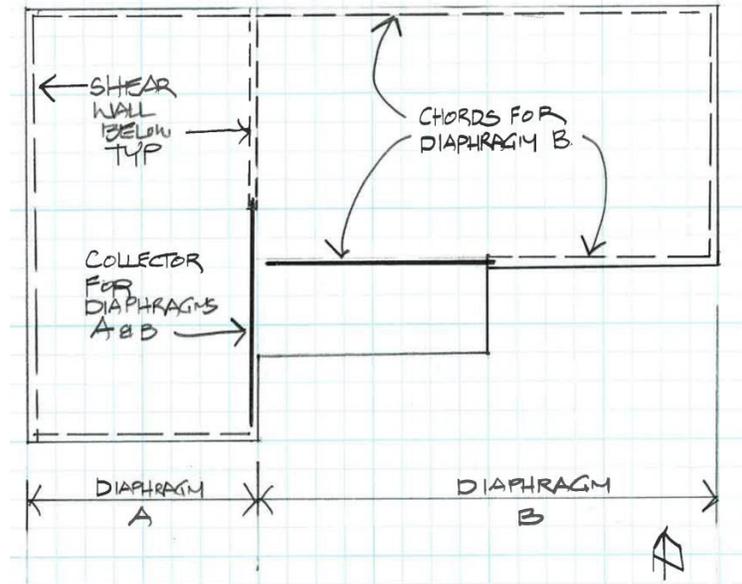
Diaphragm plan showing chord and collector for more complex diaphragm configuration
